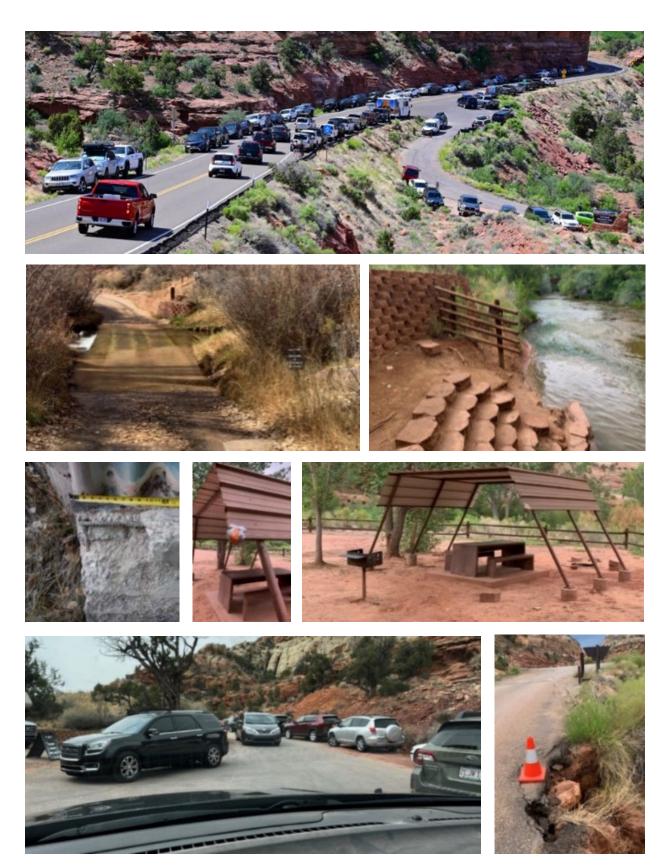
Healthy and safety concern examples (top down, left to right): parking along highway and site road; low water crossing; retaining wall and steps at water play area; concrete damage to base of culvert-style creek crossing; shade shelter with exposed footers and low overhead clearance; congestion at entrance to main parking area; pavement damage to edge of site road.
